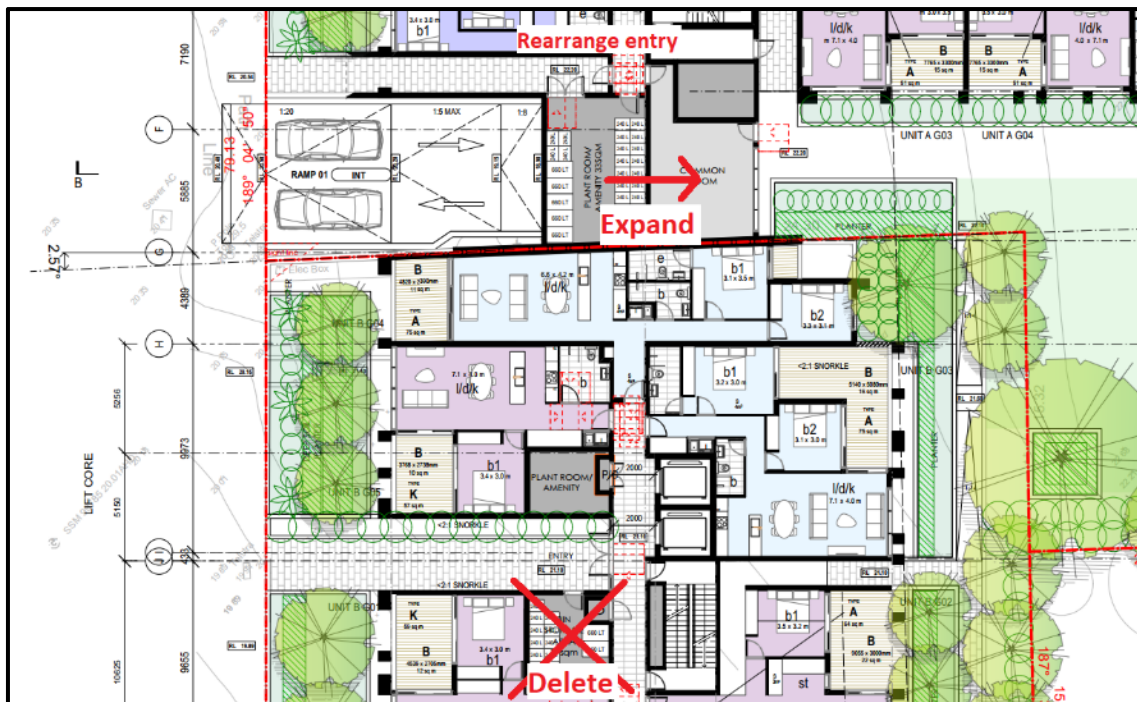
Ground Floor Plan diagram showing the proposed condition to consolidate the two bin rooms and improve accessibility.
